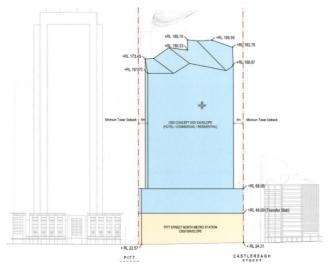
Concept SSD DA - Envelope - South Elevation Source: SSD 8875 Concept Stamped Plans
